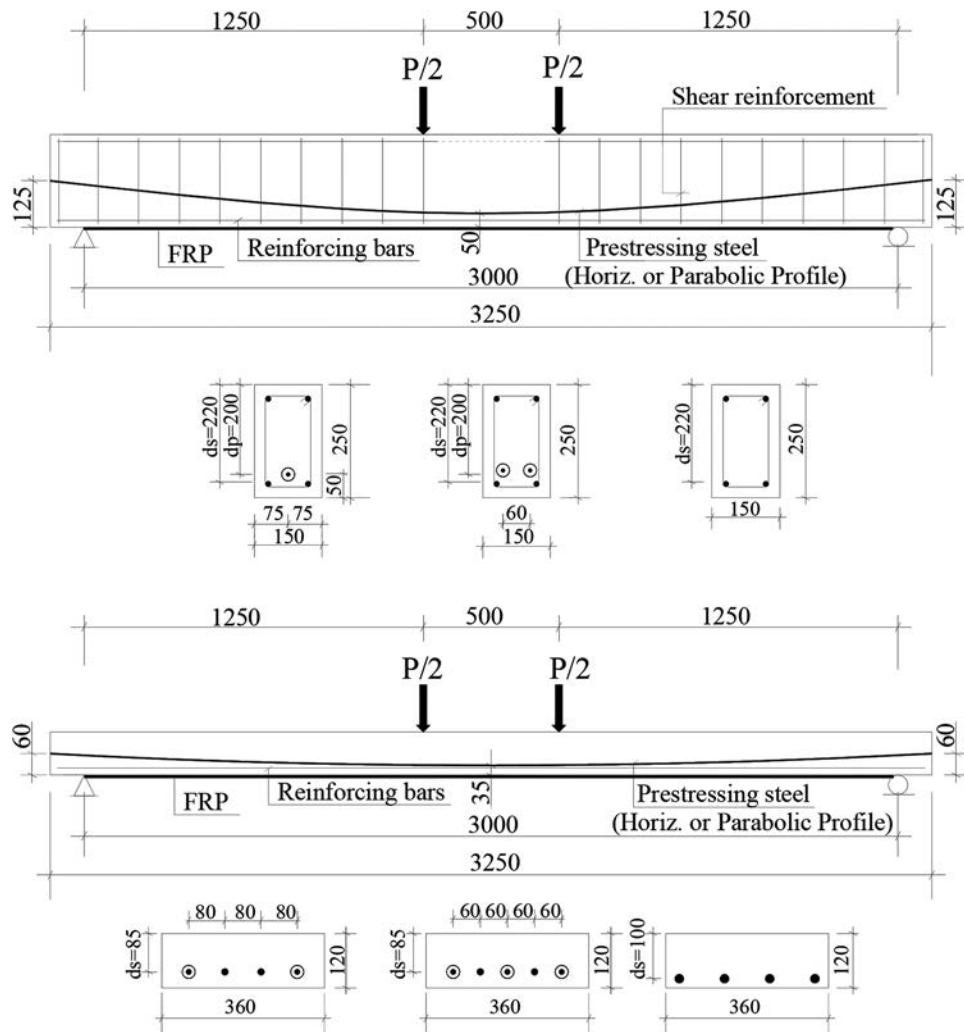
Typical dimensions and reinforcement details of the beam and slab specimens. (Note: dimensions in mm; 1 mm = 0.039 in.)
